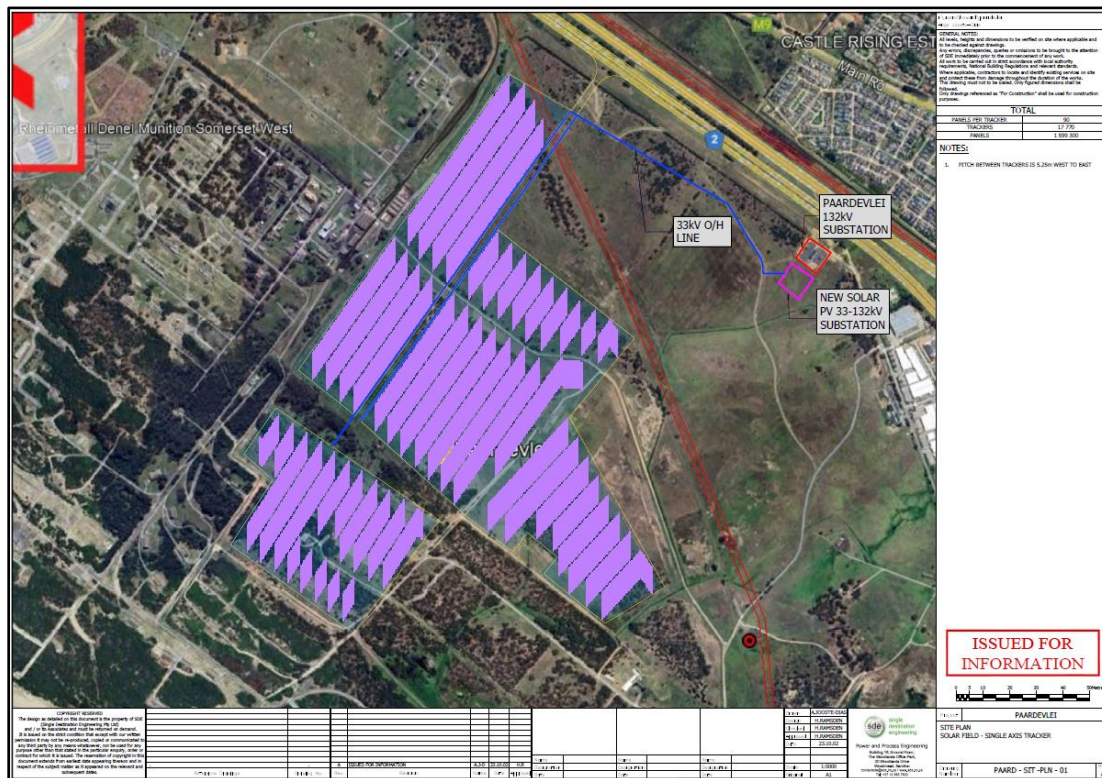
Paardevlei Solar PV Facility & BESS project -PV Layout 1 (5.25 m pitch)
